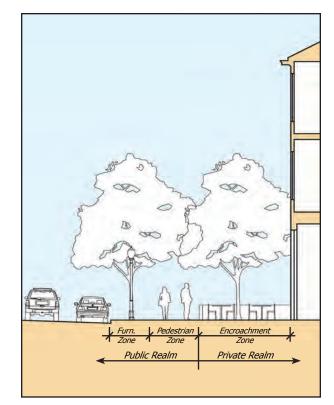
Cross Section, Terrace Front Frontage (Illustrative)
